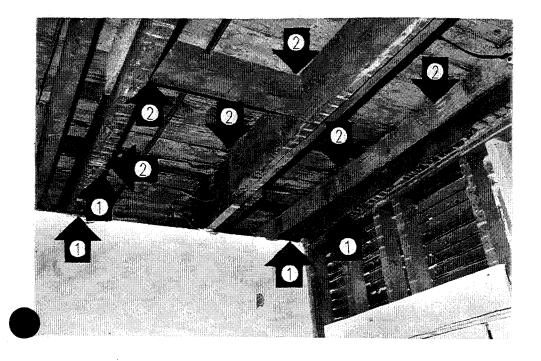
HEAD-ERS IN CEILING FRAMING AT ROOM 104
